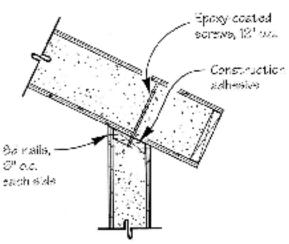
At the ridge, panels can be reinforced internally (top), or supported from below by a ridge beam (center). The author prefers the ridge beam because it prevents thermal bridging. At eaves (above) and gable ends, roof panels extend past wall panels, and are attached with long screws and adhesive.
